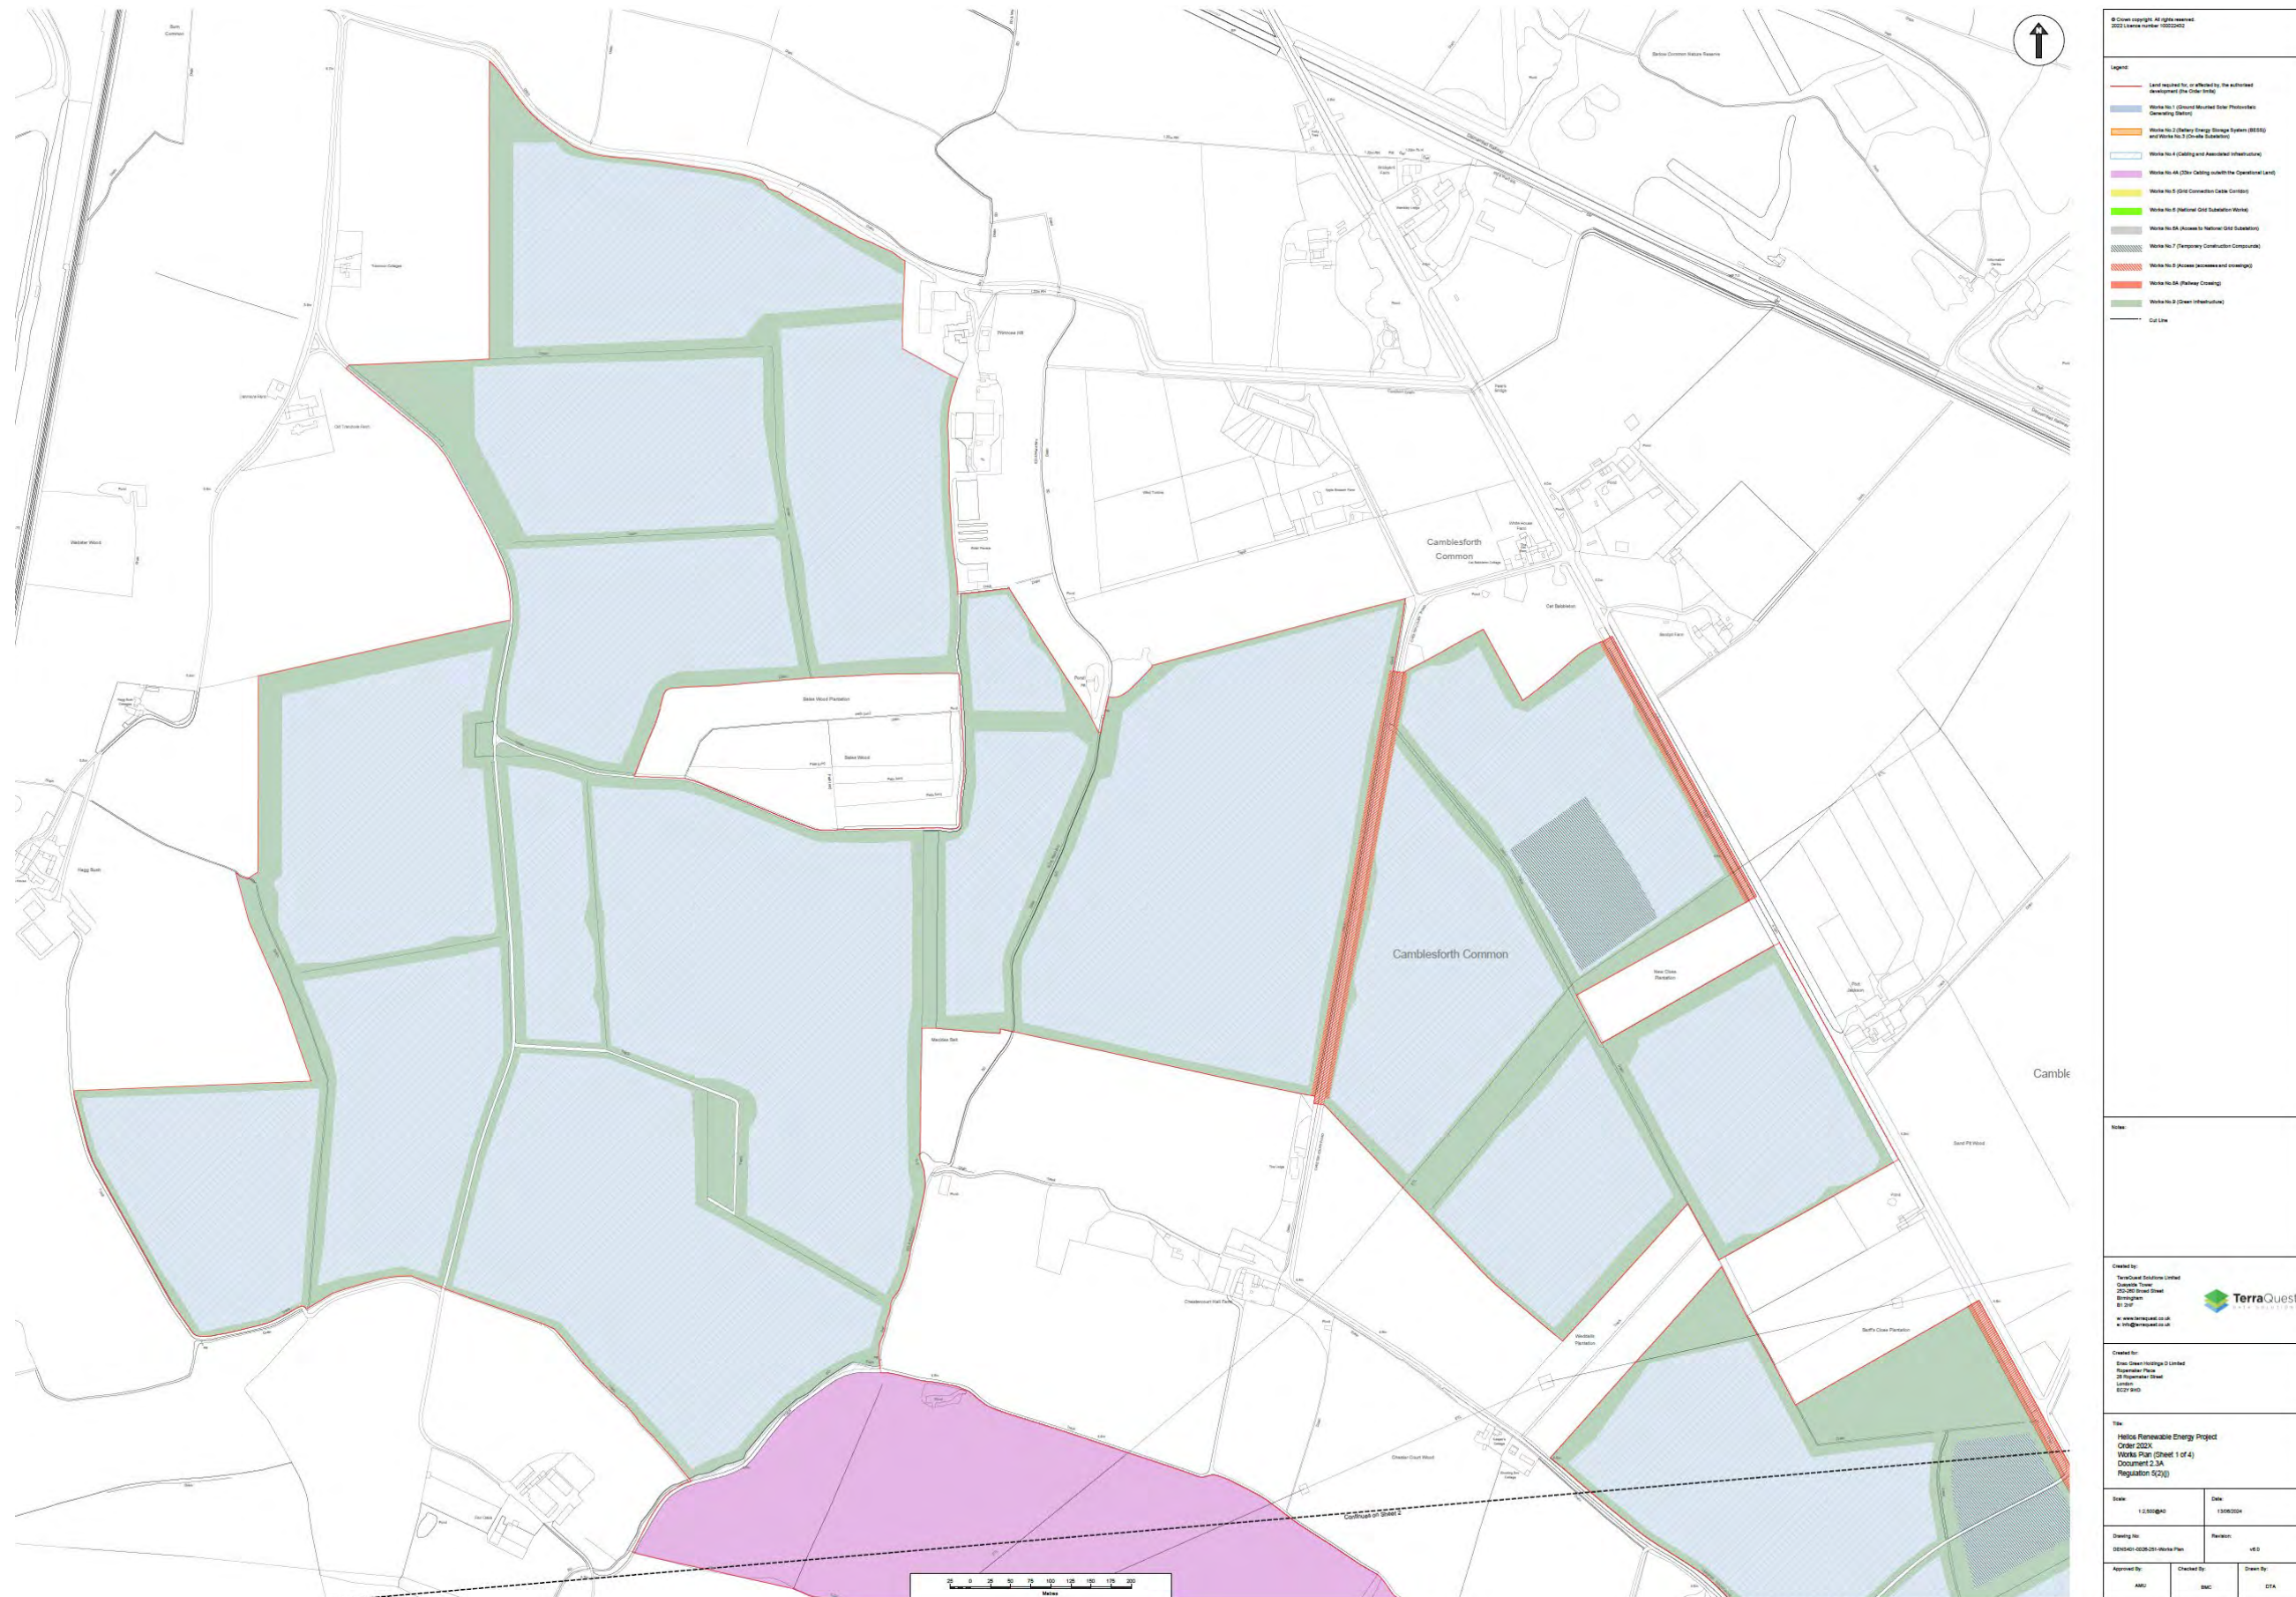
Works Plan [EN010140/APP/2.3] (Sheet 1 of 4)
